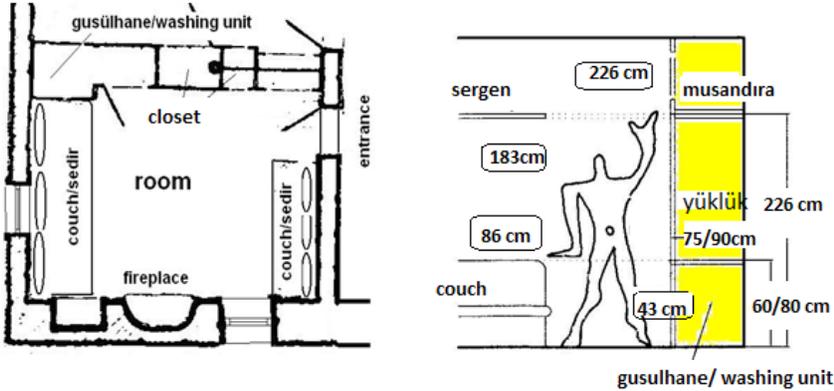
Storage Elements and Room Design, Storage Element and Proportion System in Traditional Turkish House (Günay, 1999,140).
